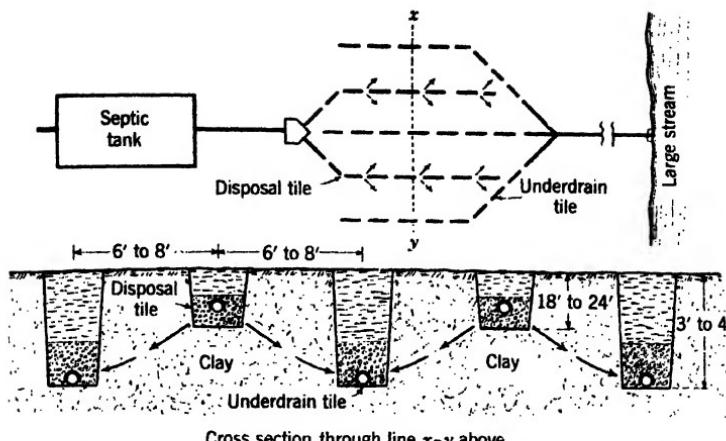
Plan of an underdrained disposal field suitable for soils open enough to provide some seepage or where there is a shallow water table. Effluent must be disposed of in a sanitary manner.
